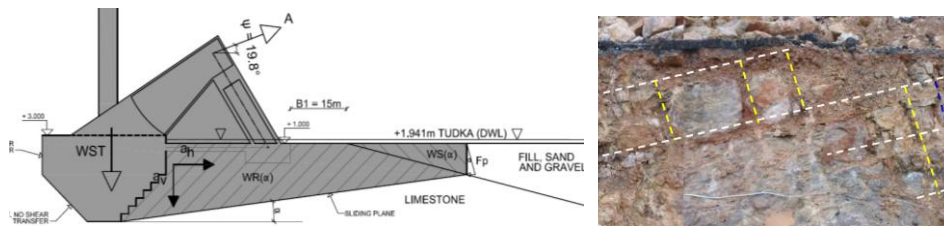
(a) Failure mechanism assumed for North anchor block; (b) Photo of interpreted bedding discontinuity planes in trial excavation wall (white broken lines)
